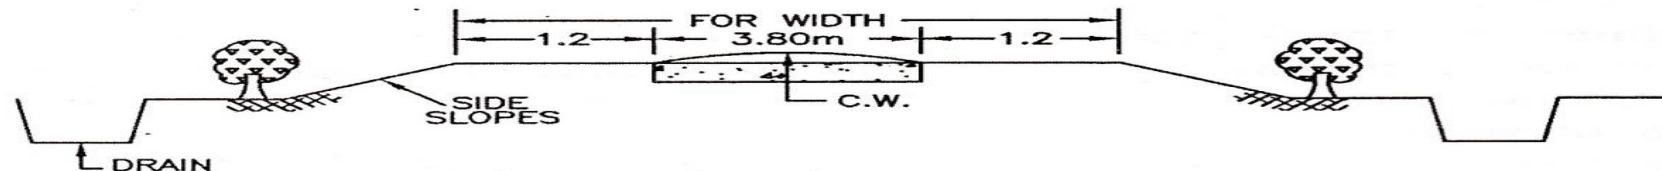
CROSS-SECTION OF VR OR ODR IN EMBANKMENT IN RURAL AREA
